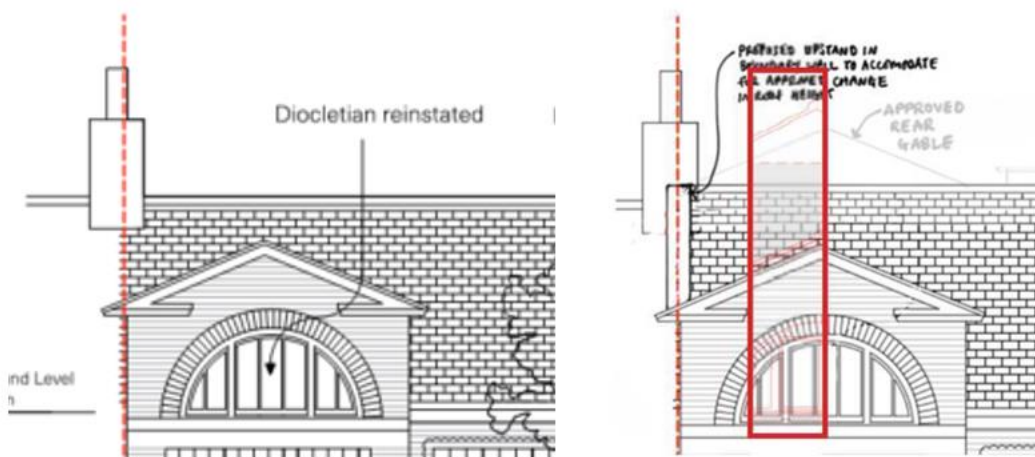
Left image showing approved front elevation as part of application 2019/6089/P. The right image shows the front elevation approved as part of application 2021/3072/P. The red box over this elevation shows how the as-built front elevation provided by the appellant in figure 1 implies the grey area along the ridge roof is what had been approved, but this goes beyond what is shown on approved drawings for applications 2019/6089/P and 2021/3072/P. The as built front elevation drawing provided by the owner is an inaccurate depiction of the approved versus as built situation on site.
